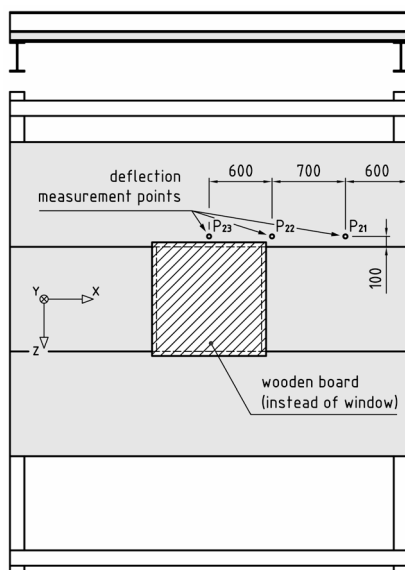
Test setup of interconnection system with three sandwich panels and large window opening (width equates to entire width of the panel) in the middle panel.
